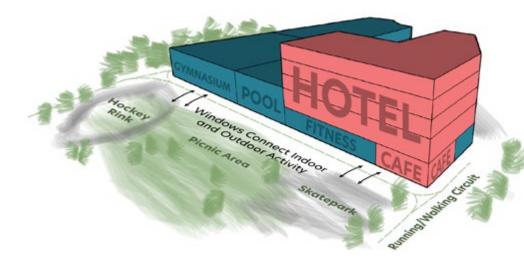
(Facing southwest) 3D isometric diagram of the facility
